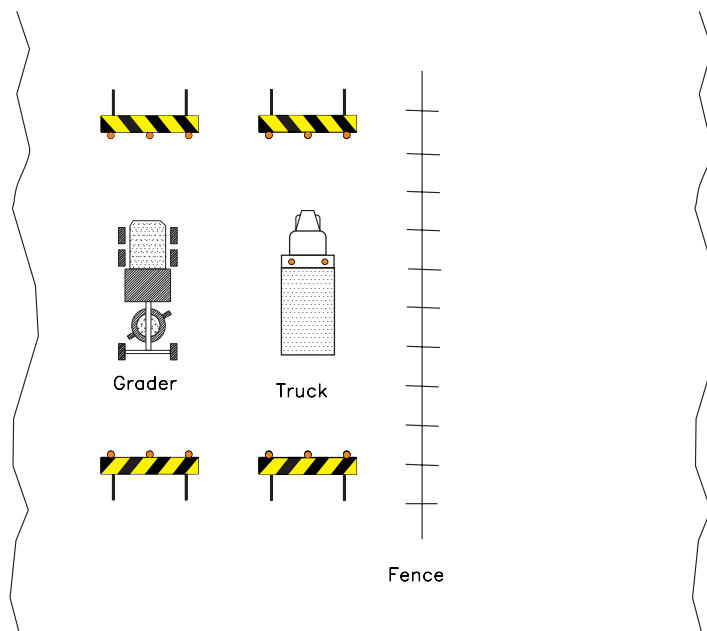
Method of worker protection when repairing plant on construction sites.
